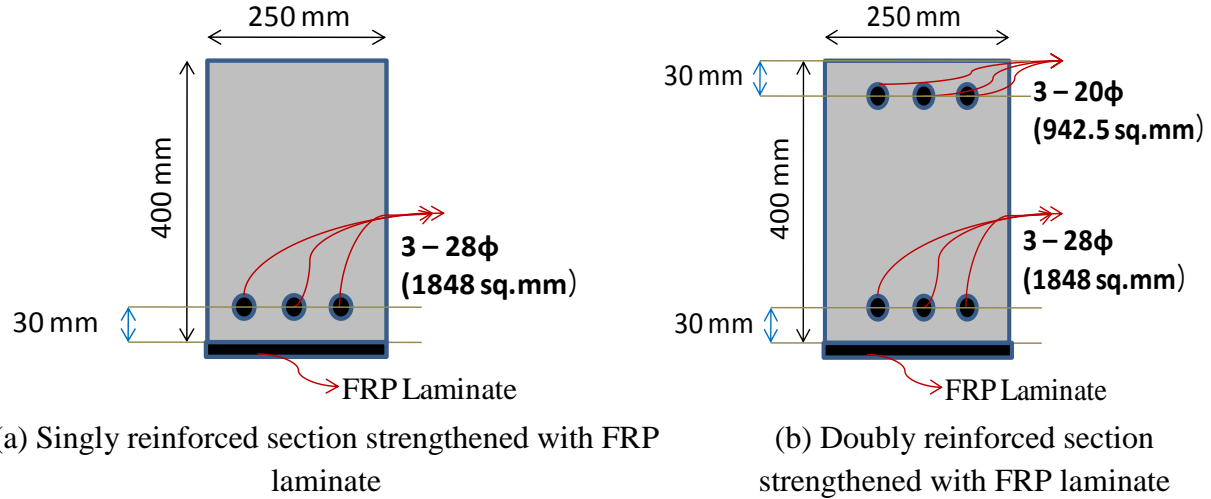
Detailing of rectangular RCC cross sections strengthened with FRP laminates
